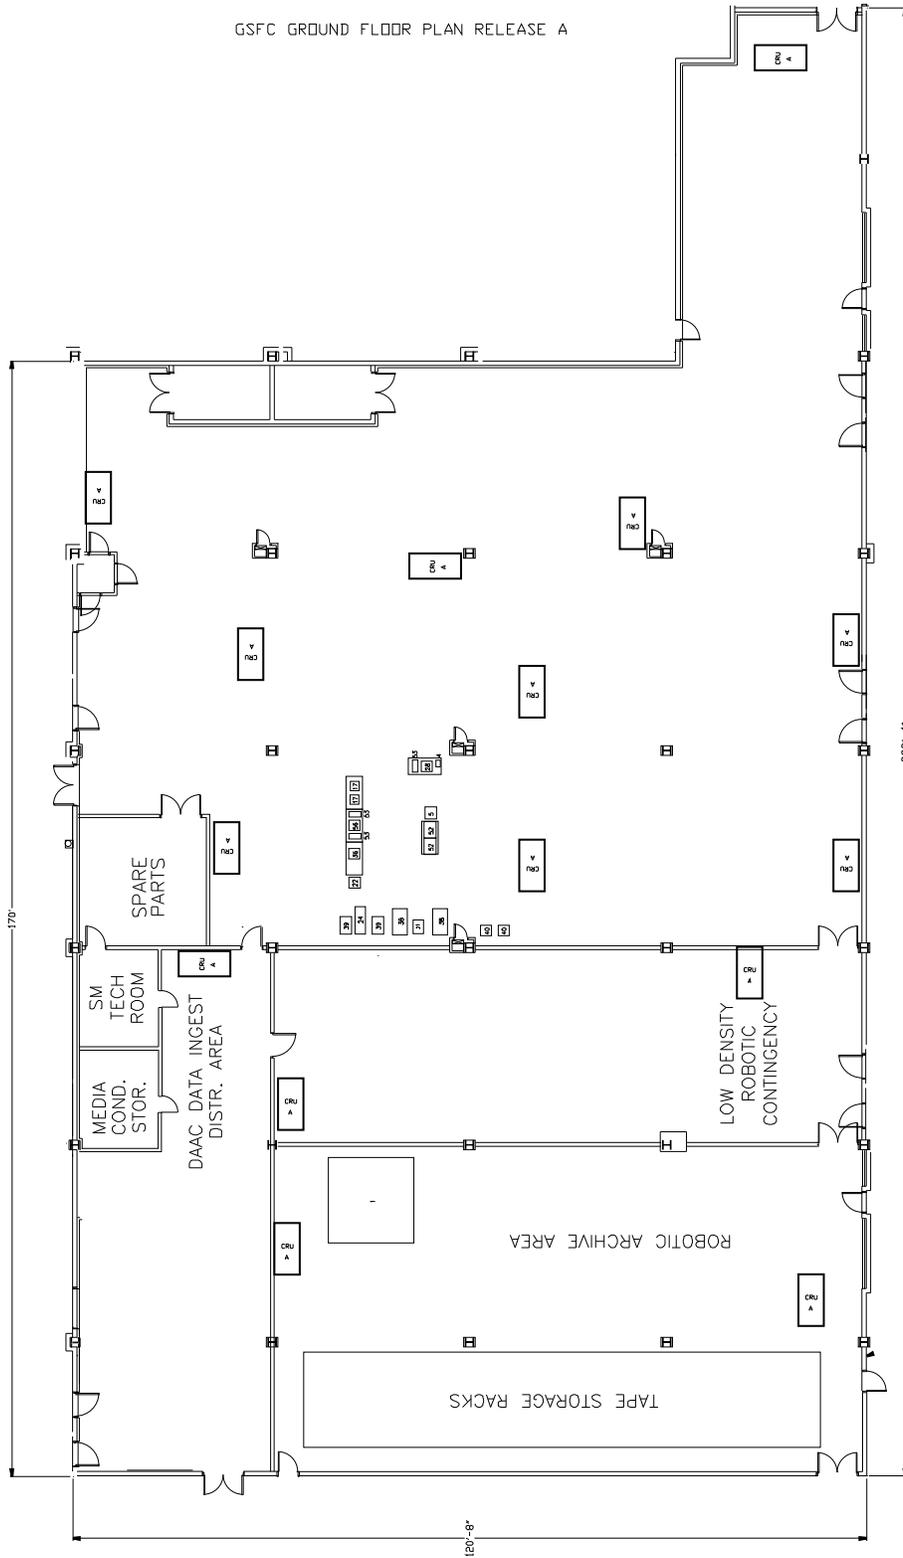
GSFC Floor Plan — Ground Floor (Release A)
